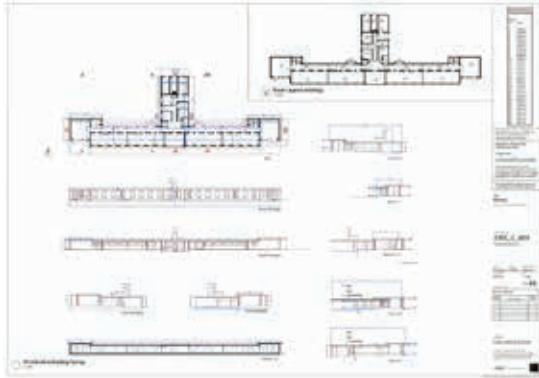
OBFA – Early modelling outside formalised BIM execution plan.
